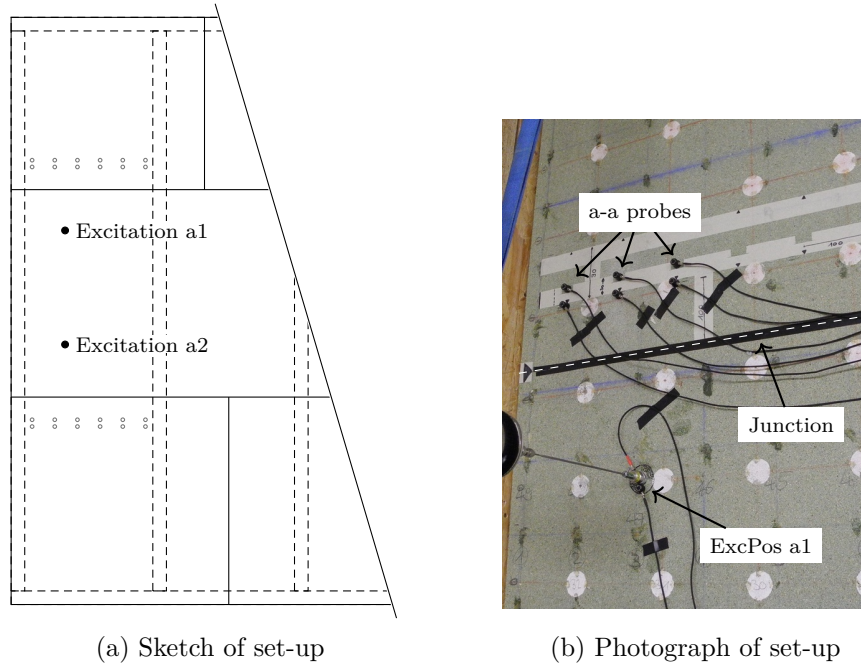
Experimental set-up on the timber-frame wall in the basement of the test structure to determine the CLF of the tongue and groove chipboard joints with structural intensity.
